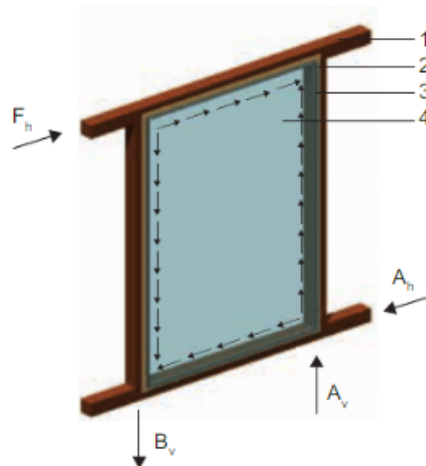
General build-up and the load-bearing principle of a timber-glass shear wall element (Štrukelj et al. 2015).
